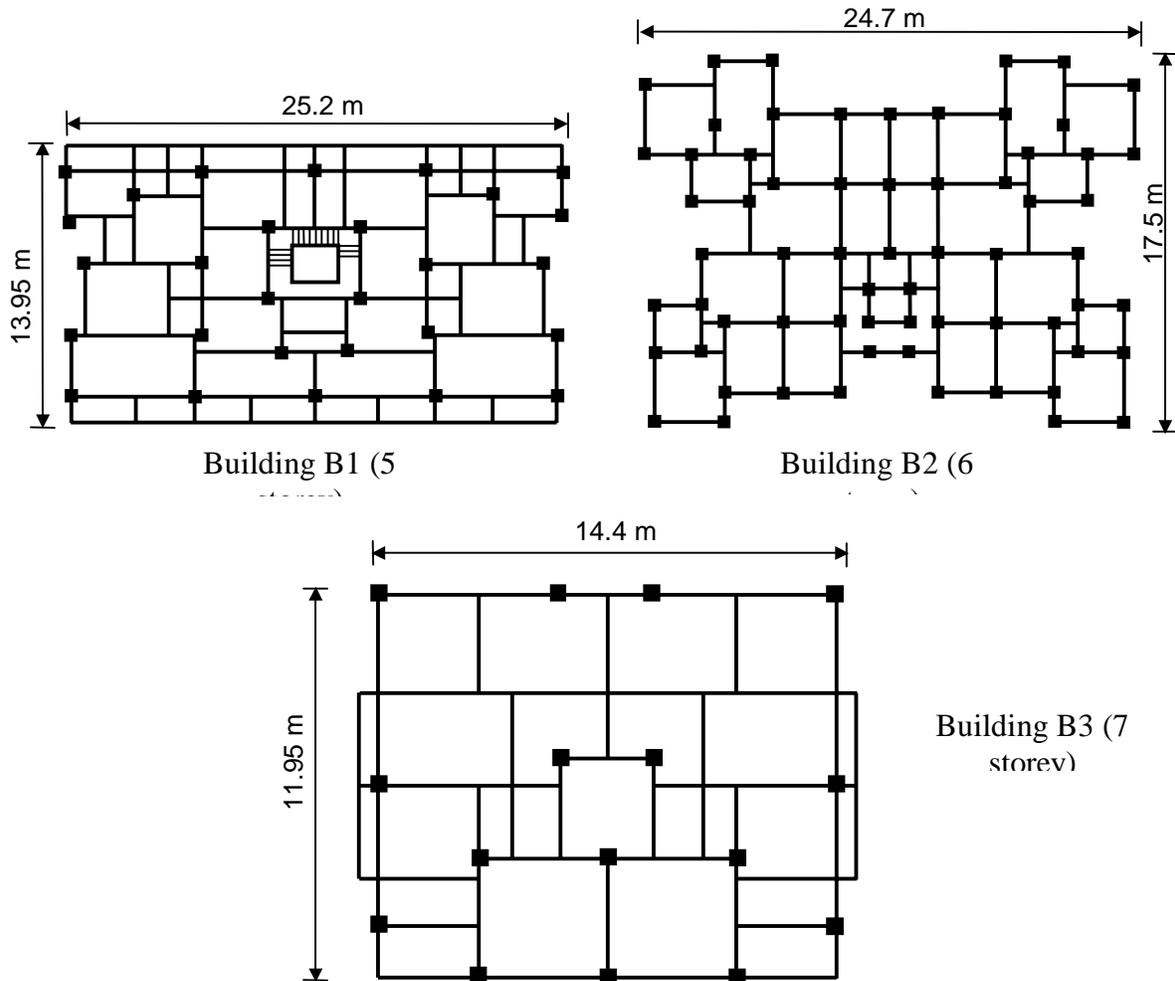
Typical floor plans of Building B1, Building B2 and Building B3.
